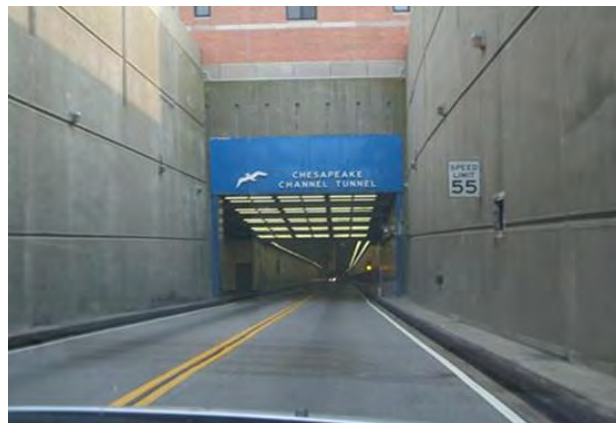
Outside view of Chesapeake Bay Tunnel.
